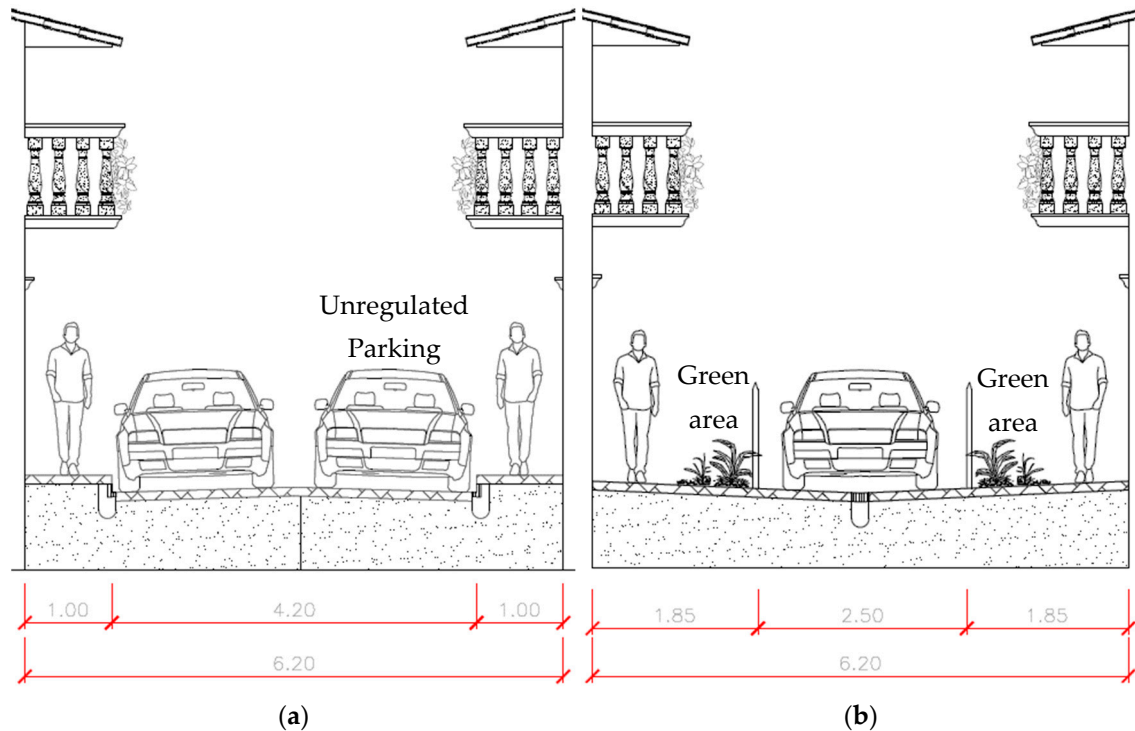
(a) Current Street transversal section scheme; (b) Improved Street transversal section scheme proposed.
